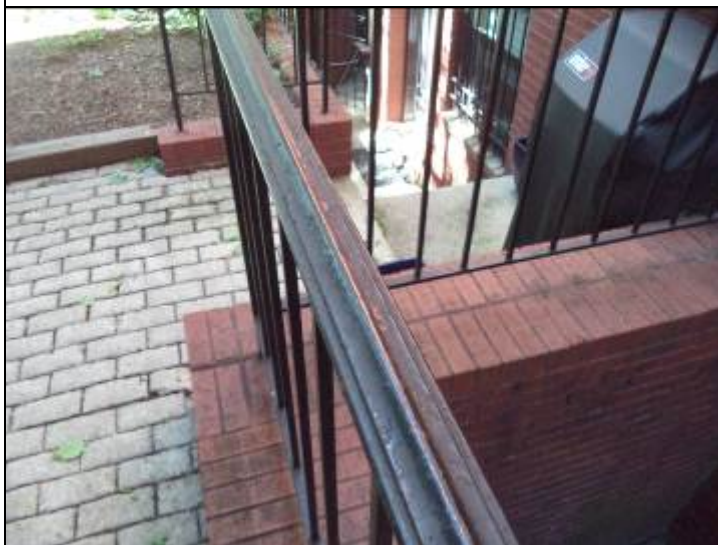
Outside of building 1225 there is a differential in the walk, which presents a trip hazard.
